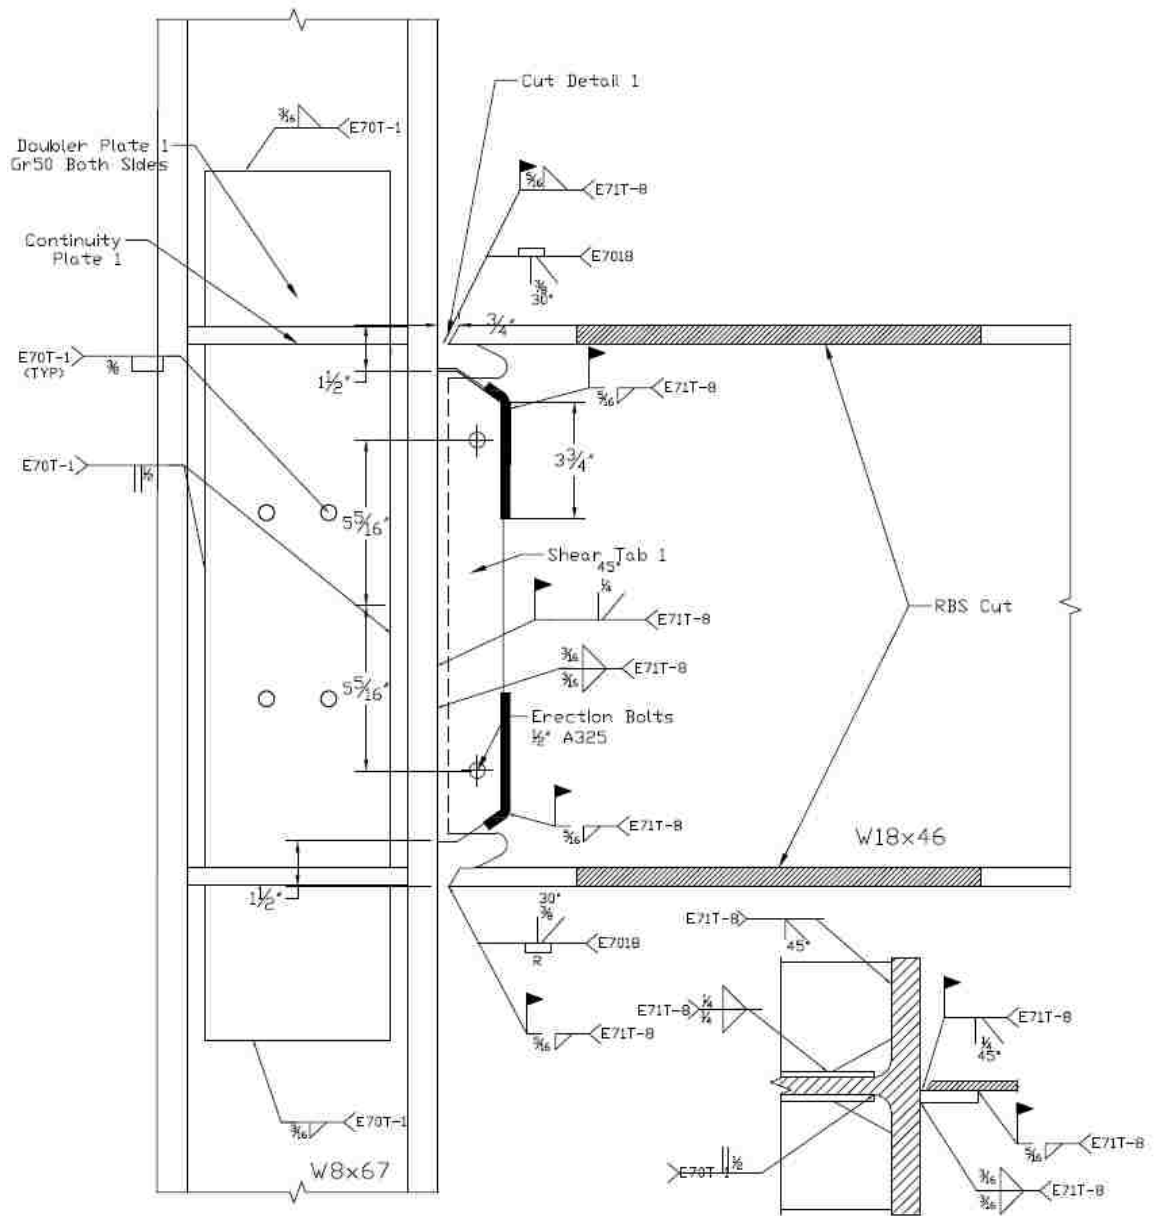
MRF 1st Floor Beam-to-Column Connection Details
